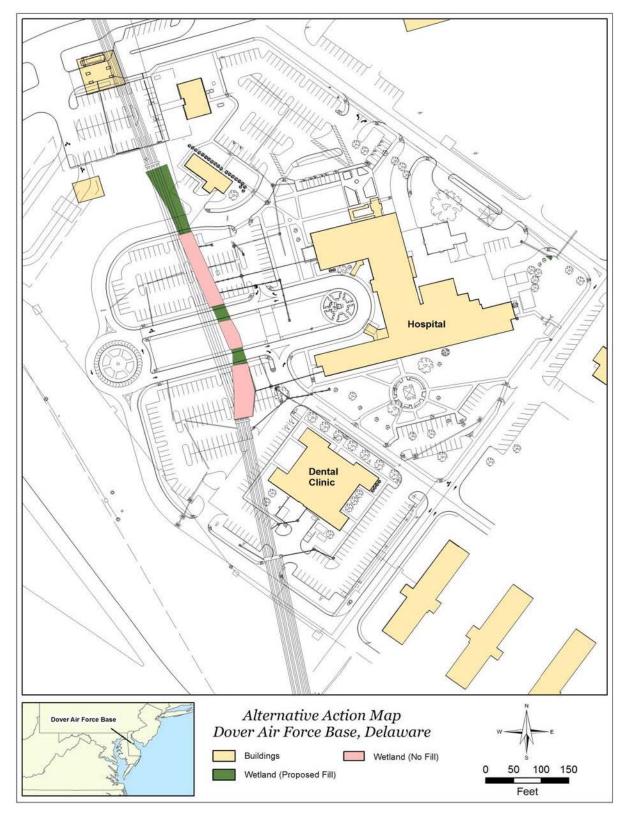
Alternative 1 – Construction of Discontinuous Parking Lots.
